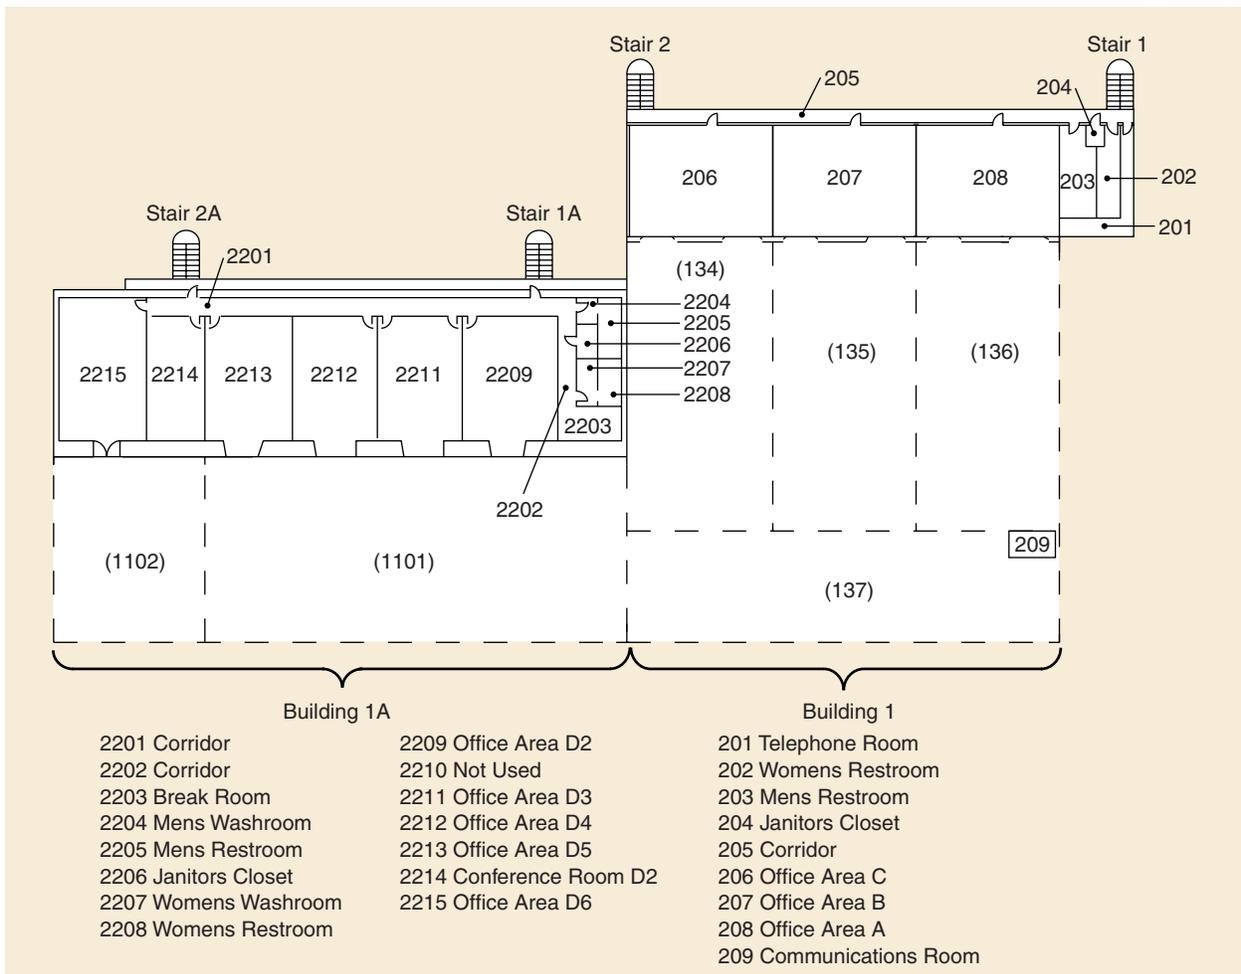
Second-Level Floor Plan, Building 1/1A (PPF), Astrotech
